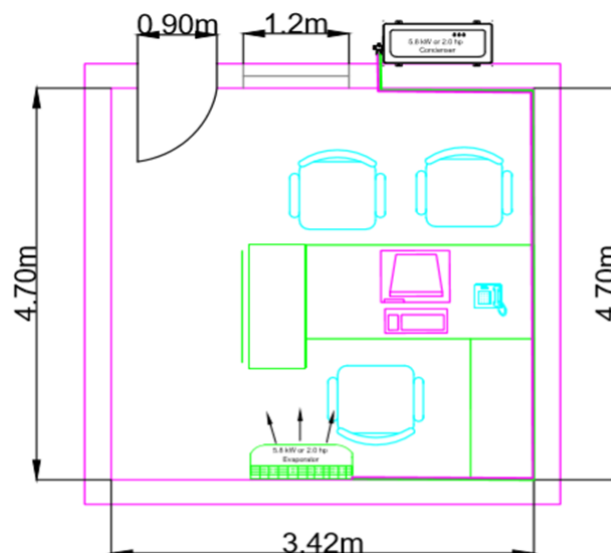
Office space plan with 2.0hp split air-conditioning unit
